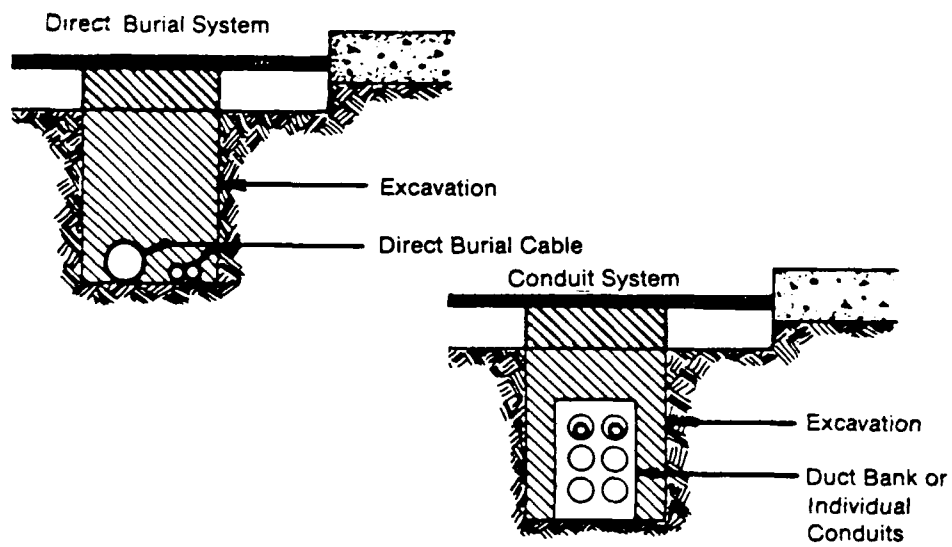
Alternatives for Underground Electrical Installation. (From Innovative Site Utilities Installations, HUD.)
